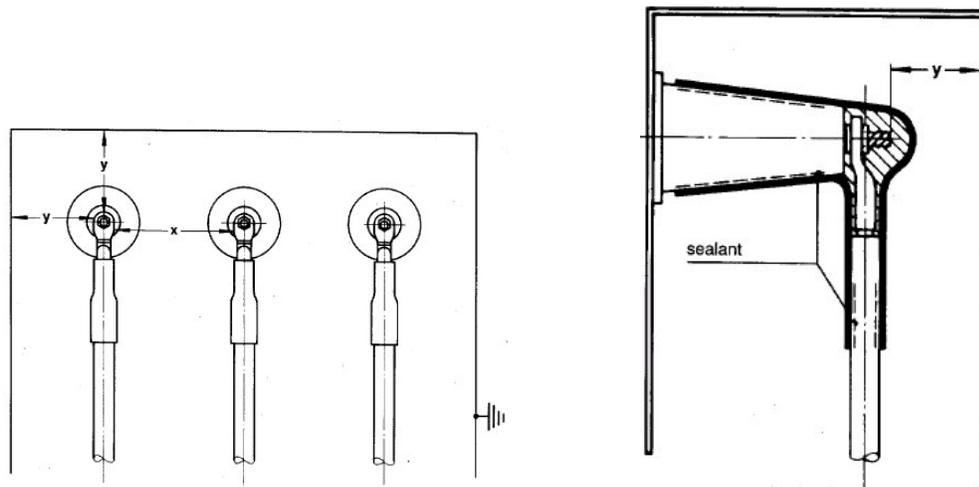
7.2 kV-36kV Indoor Termination as Connection to Equipment with Cable Boxes
